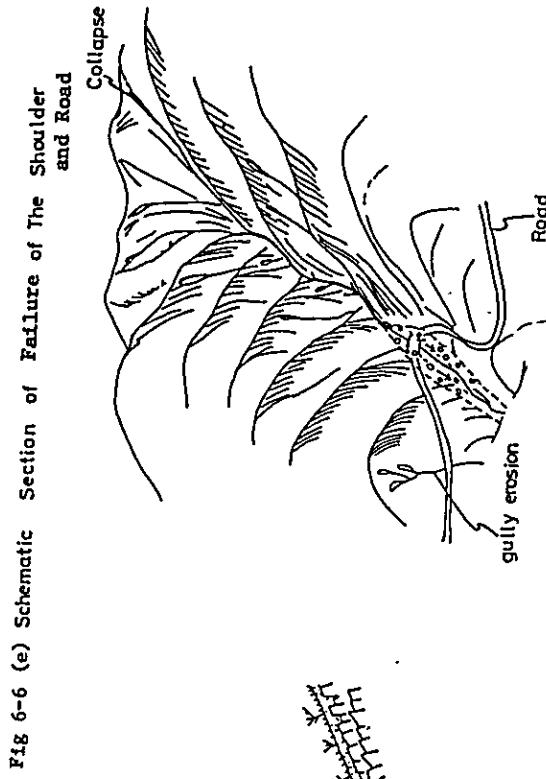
(e) Schematic Section of Failure of The Shoulder and Road
